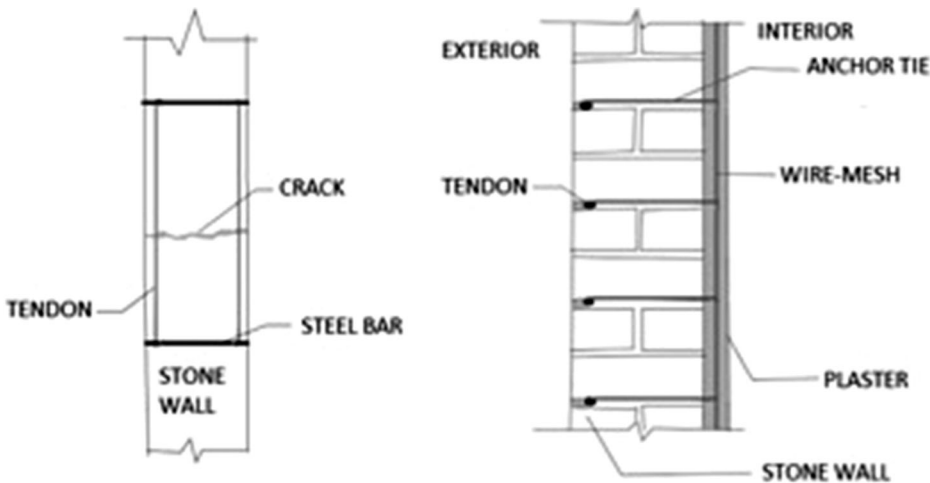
(a) Use of anchors containing steel bars and tendons and (b) wire-mesh and plaster application to the internal walls.
